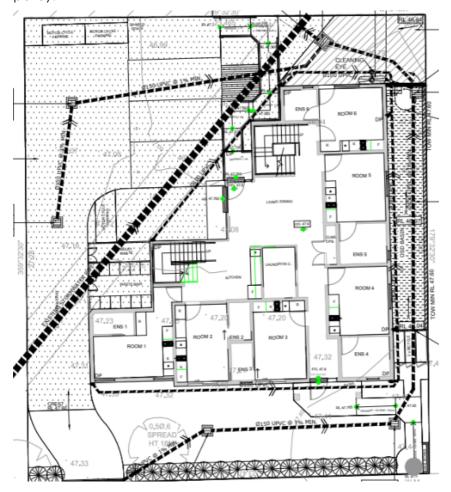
Stormwater Management Plan. Source: GEBA Consulting
